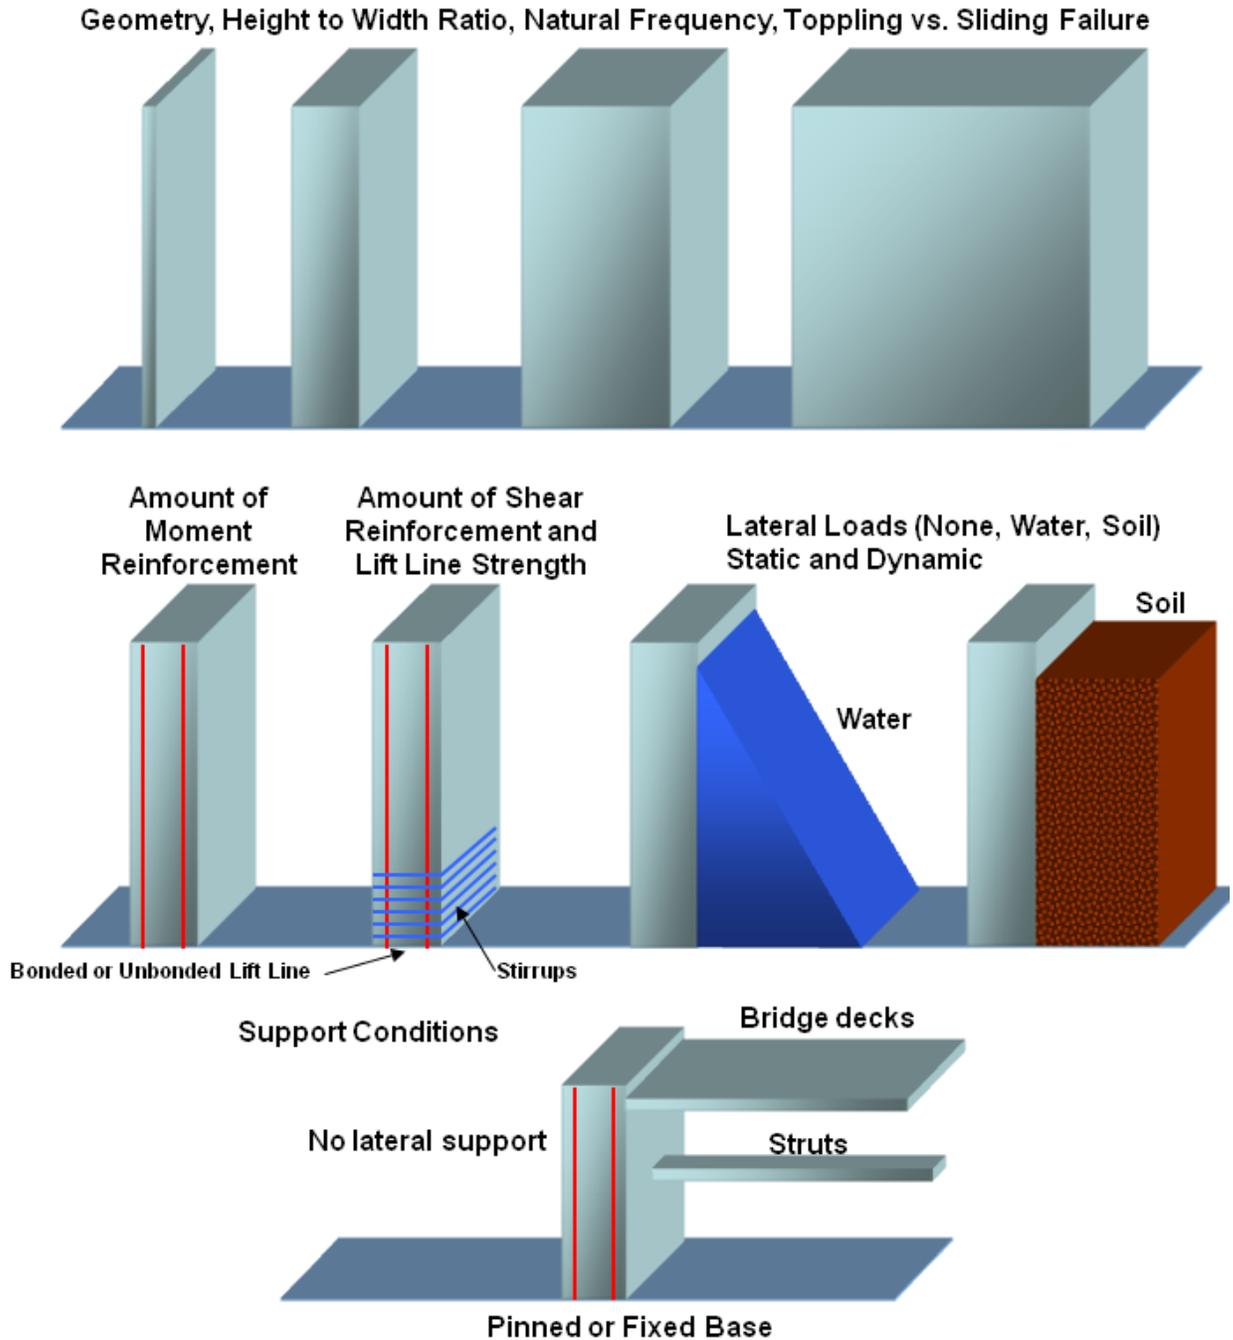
Typical Geometry and Support Conditions for Reinforced Concrete Members in Hydraulic Structures.
